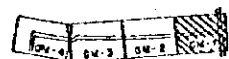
Plan of Gede/Bor Drainage Channel (I)
